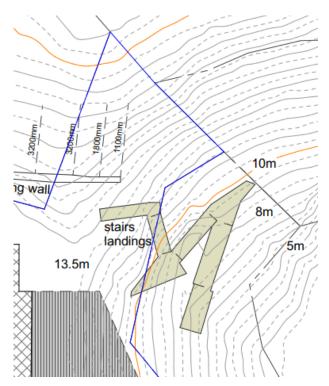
Site plan showing the stairs that have been erected partly within legal road reserve.
